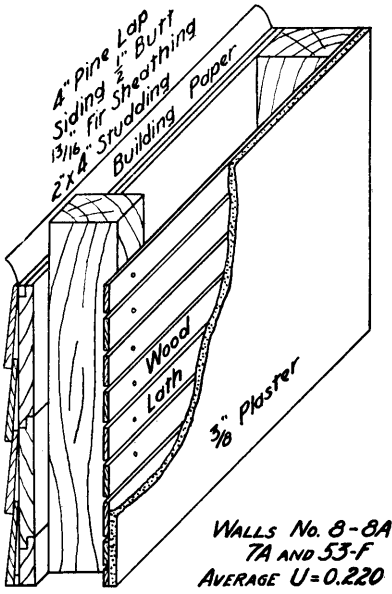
SECTIONAL VIEWS OF TEST WALLS
